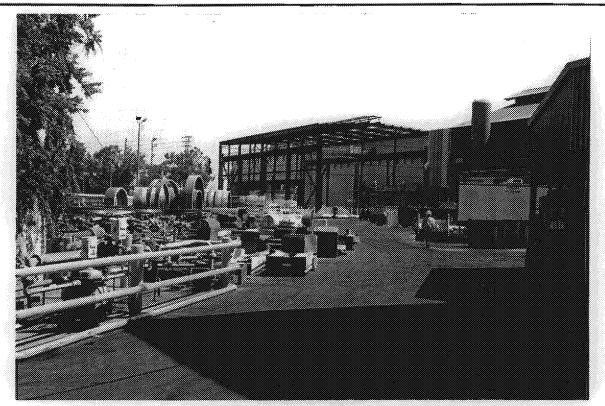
Material Storage Area, New 35,000-ton Press Construction, and Oxygen Tank at 5321 Firestone Blvd.
